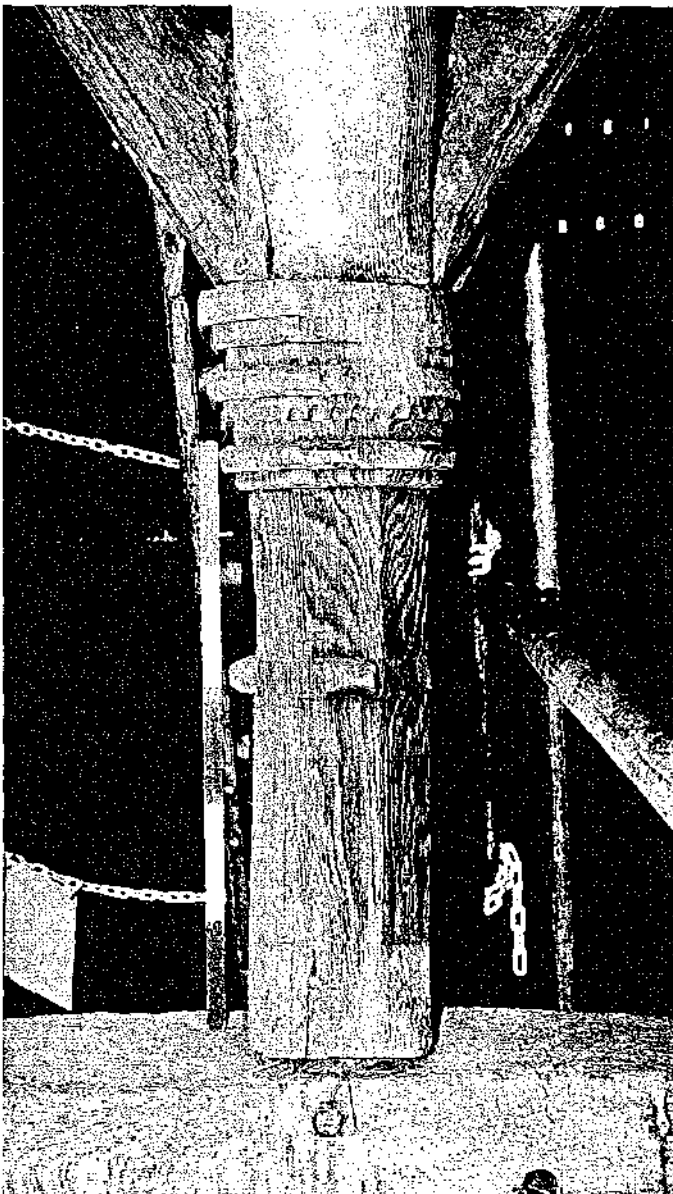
Structure 1, detail of the decoration of the crown post of an open truss (Strenberg).
